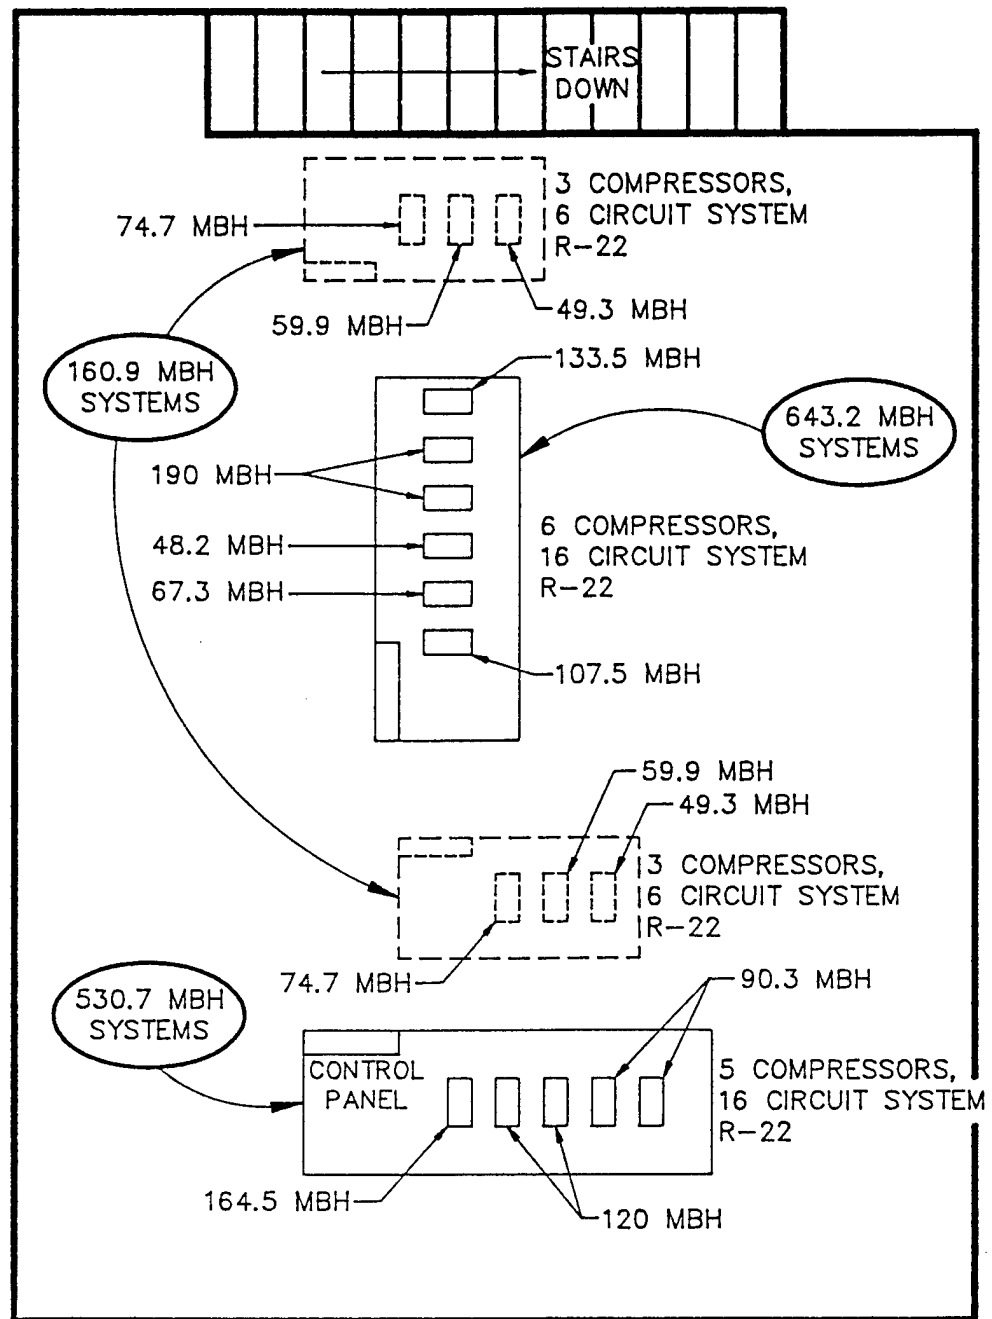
COMMISSARY REFRIGERATION EQUIPMENT LAYOUT
